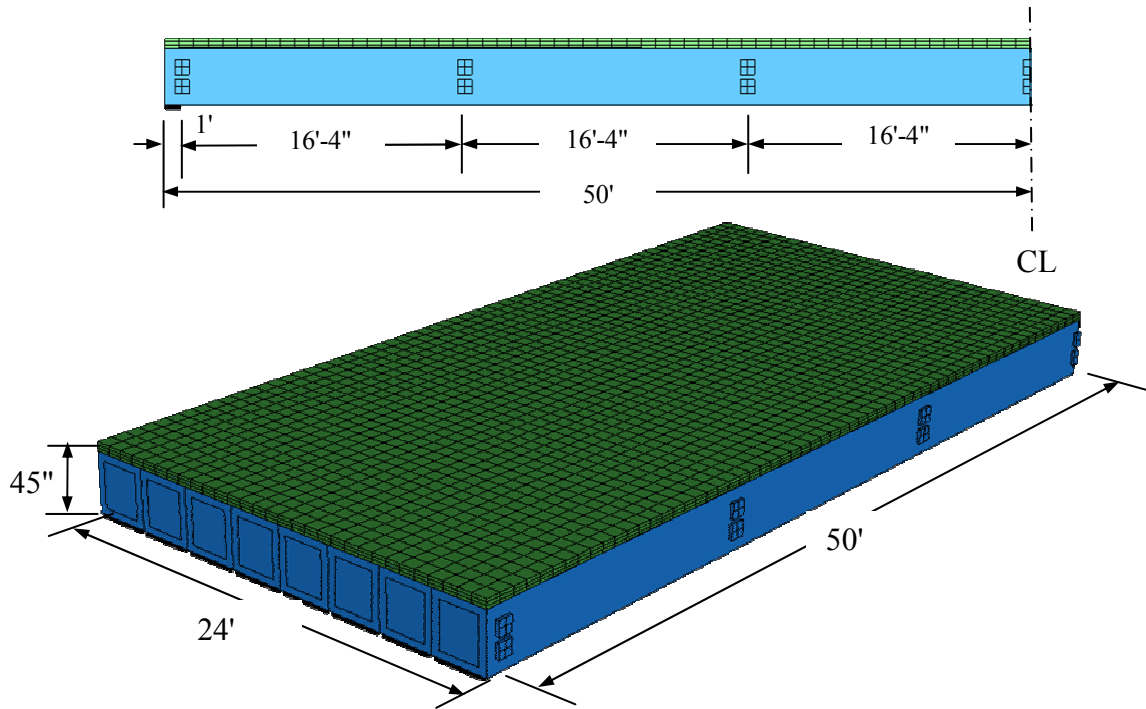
Assembly of 100 ft span bridge model constructed using 36 in. wide box-beams.
